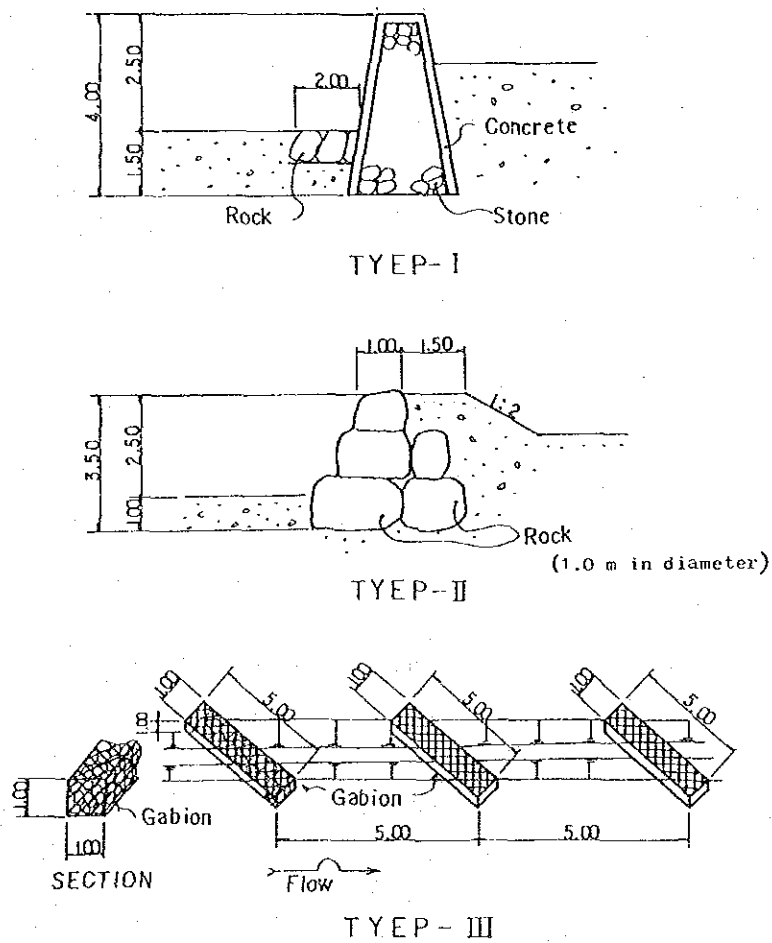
TYPICAL SECTION OF LEVEE
